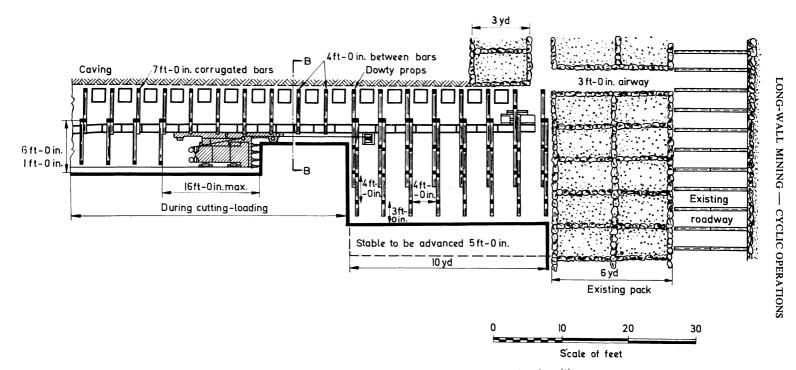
Typical roof support system on a Midget miner retreating face.⁽³⁾
